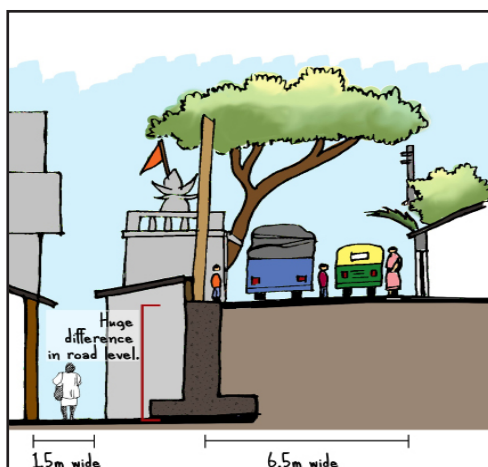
Sketch depicting the section of the road leading to Laxmi ghat. (10m wide). Source : Author. Scale : NTS
